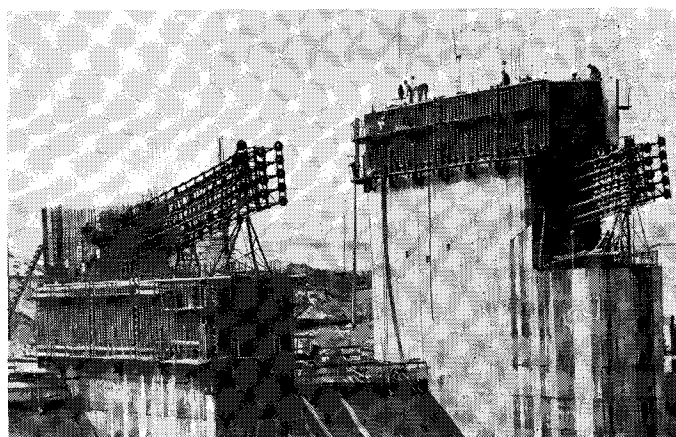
Wanapum Dam—Downstream Face of Two Spillway Piers
